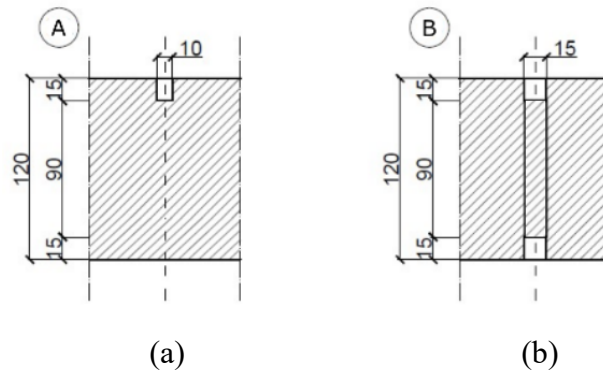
Damages in RC beam models: (a) first beam - type A; (b) second beam - type B.
